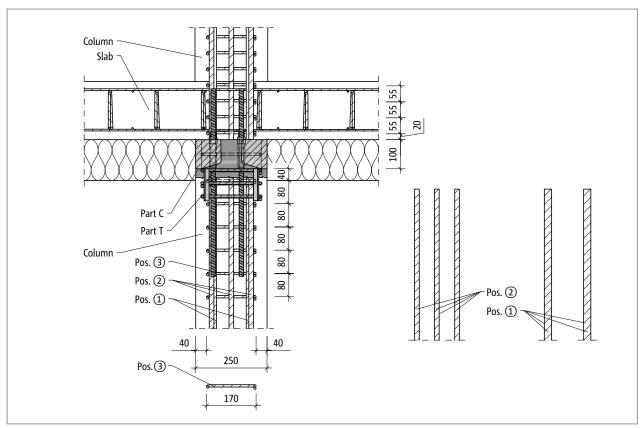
Schöck Sconnex® type P: On-site reinforcement in column cross-section A-A
